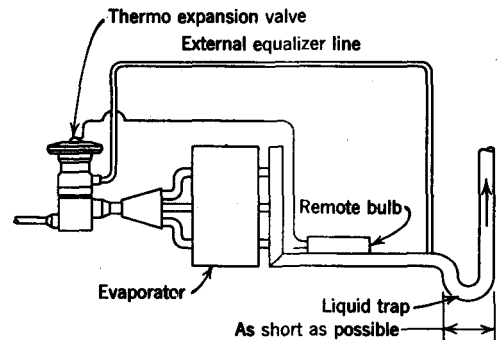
Recommended remote bulb location and schematic piping for rising suction line. (Courtesy Alco Valve Company.)
